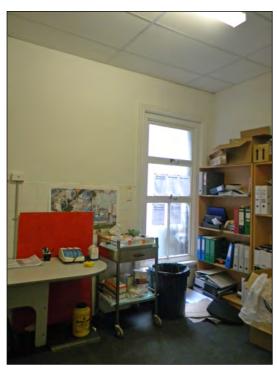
Area 6, showing the drop down panel ceiling and fireplace. Figure 75: Area 7, showing the door and window set in the northern wall.
